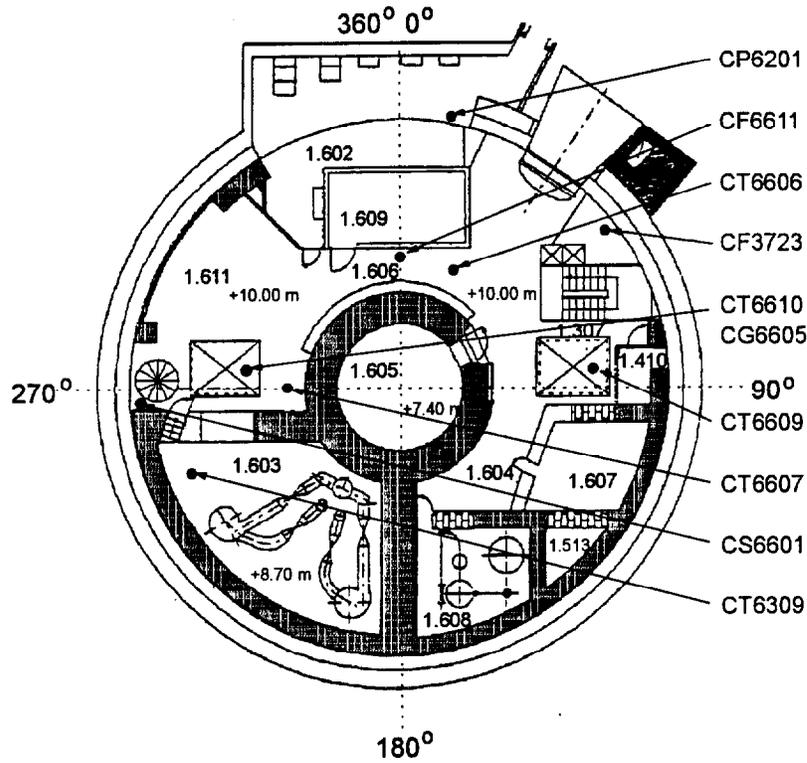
Level 1.600 at the +12.0 m Elevation for T51.2
